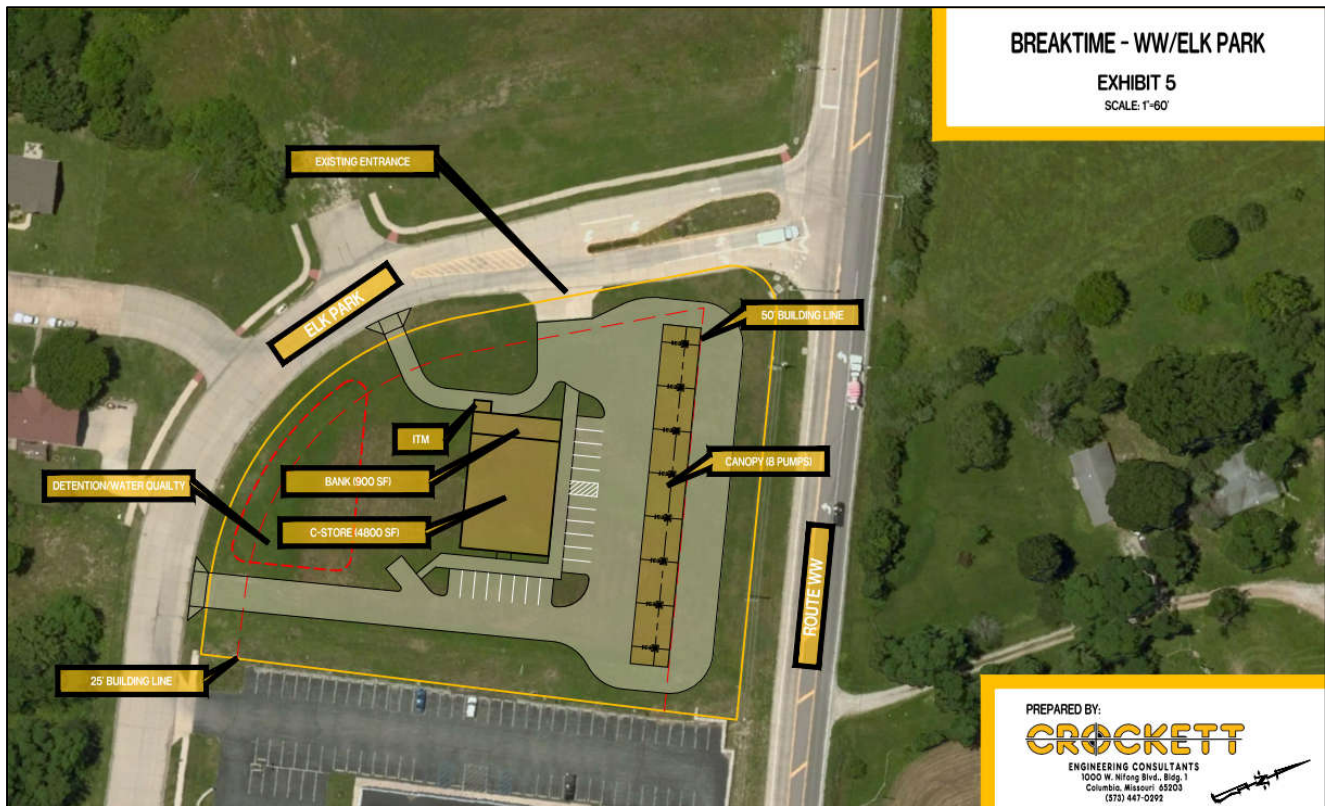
Proposed Site Plan (Provided by Crockett Engineering)
